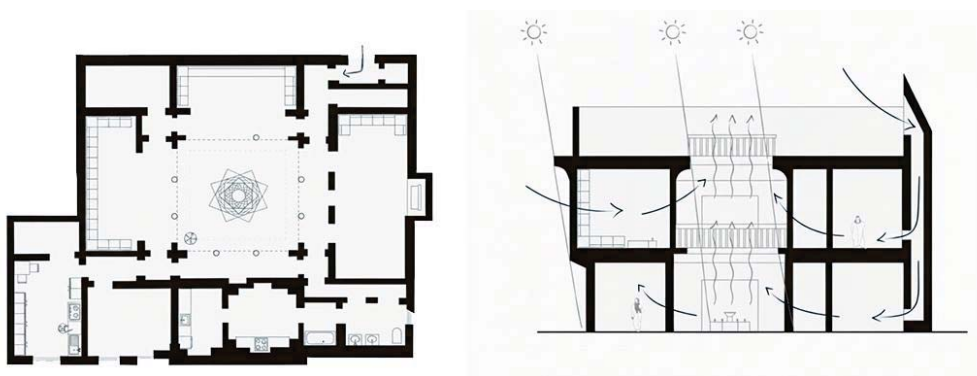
Schematic plan and section of typical Fez dwelling that rising two stories and organized around open courtyard
